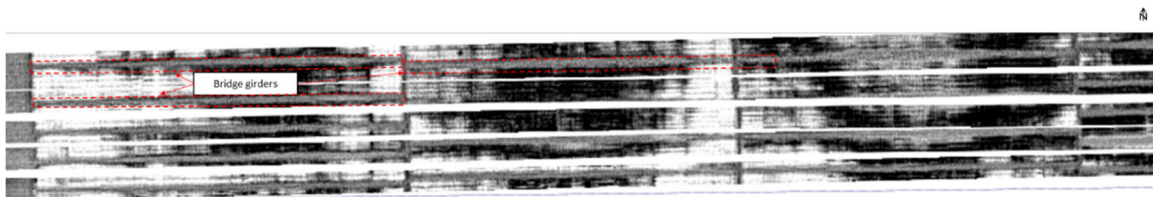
Horizontal slice of stitched 3D GPR section, representing the northwestern part of the bridge with visible signatures of girders.
